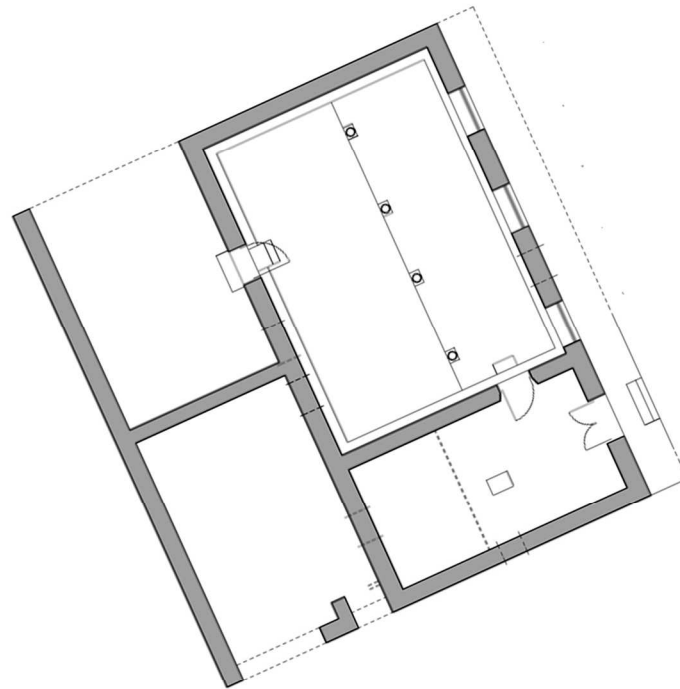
Plan of Lusthof School Building on a scale of 1:200
